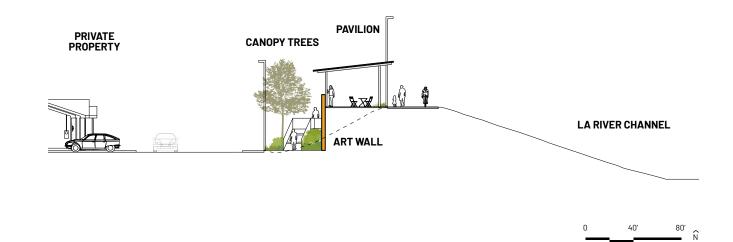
Here is a section view of an access point with parallel single switchback ramps and stairs added to get down to grade from the levee where needed.
